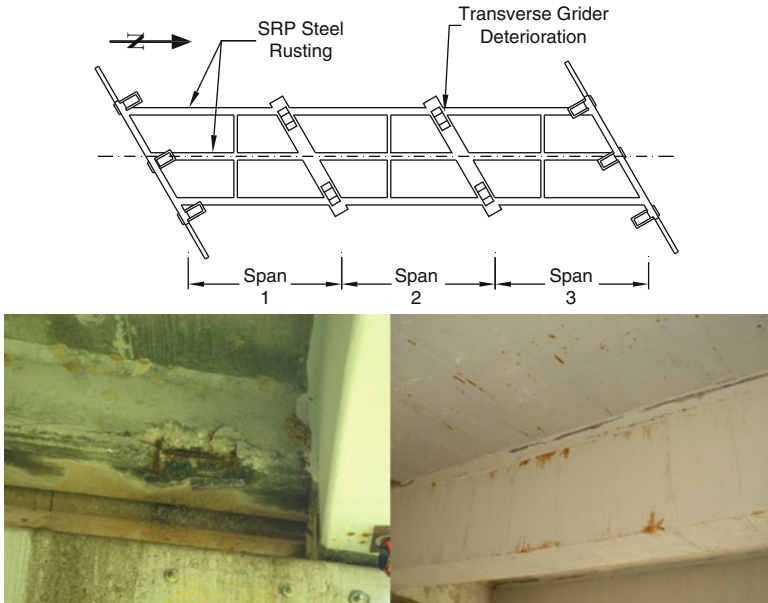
Bridge P-962 corrosion of transverse girder and SRP reinforcement
